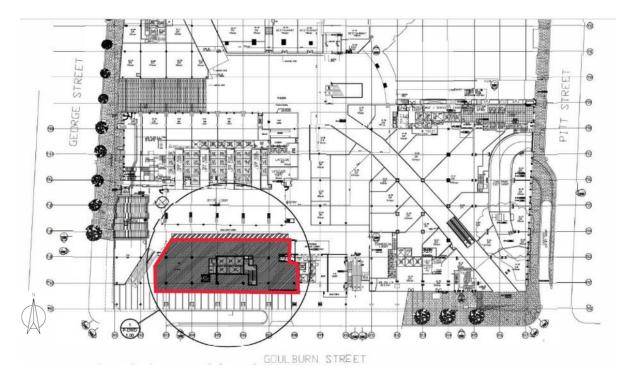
Location Plan - Level 10 (one floor above ground), tenancy 10.41 outlined in red.
